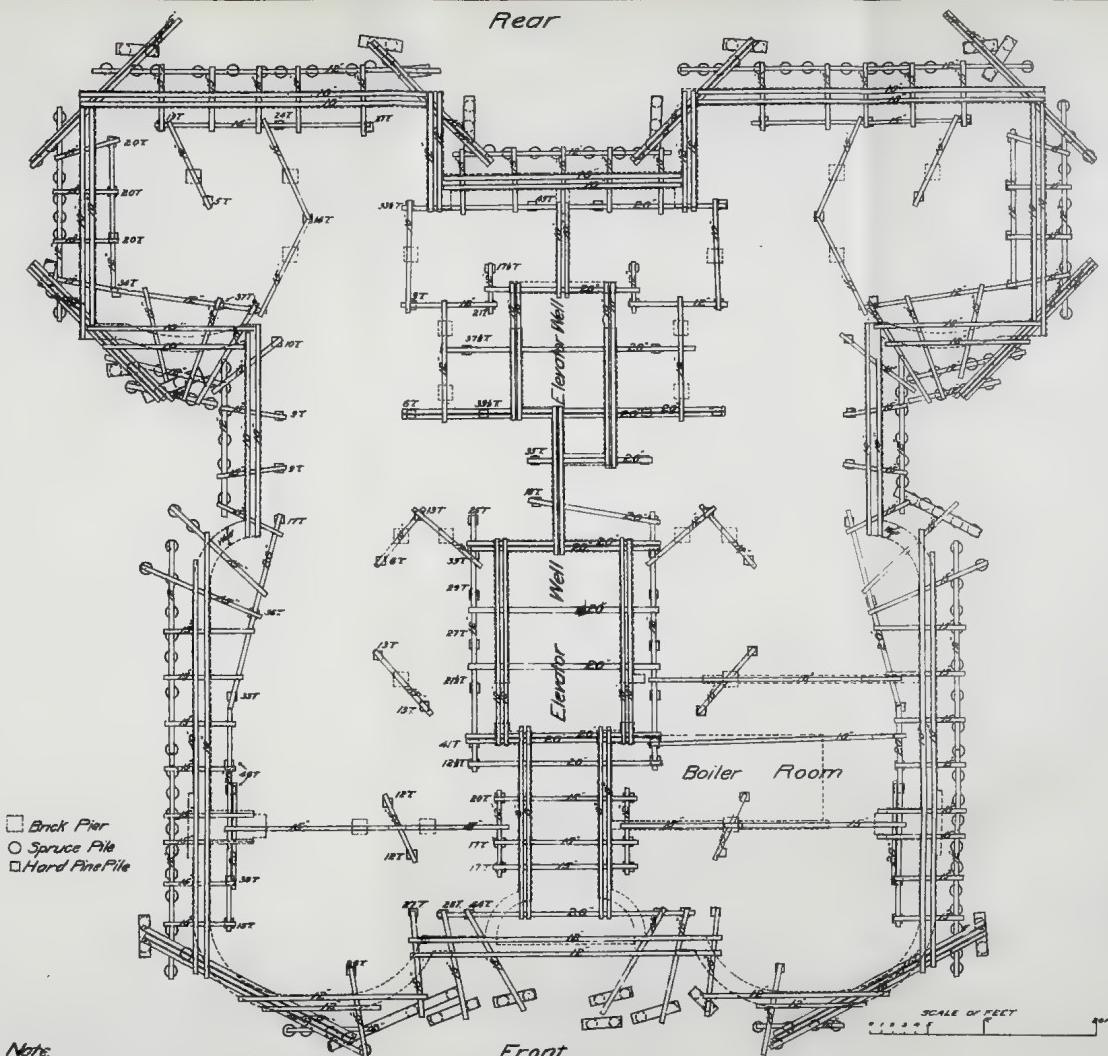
PLAN OF FOUNDATIONS OF HOTEL WOLLATON, BROOKLINE, MASS.
